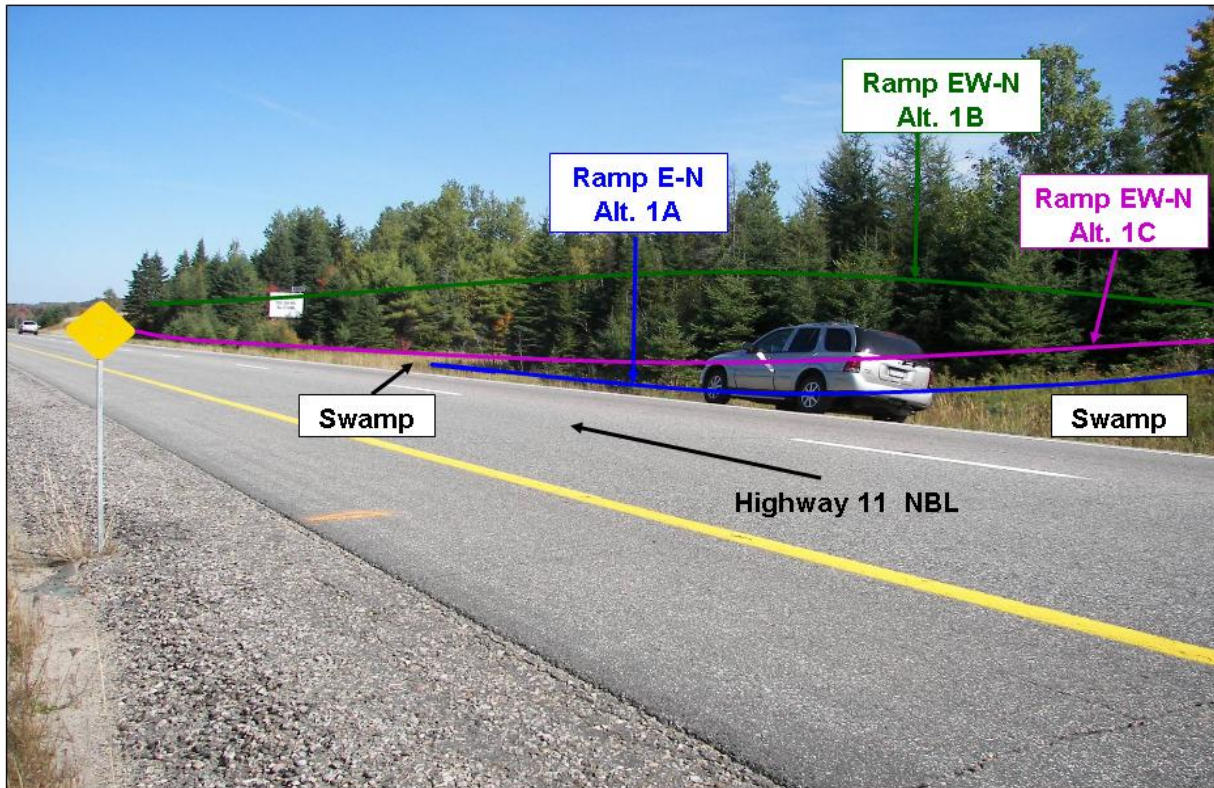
VIEW: Looking northwesterly from median of Highway 11 at Sta. 20+250 at west abutment and pier locations of I/C underpass. (Sept. 26, 2008)
